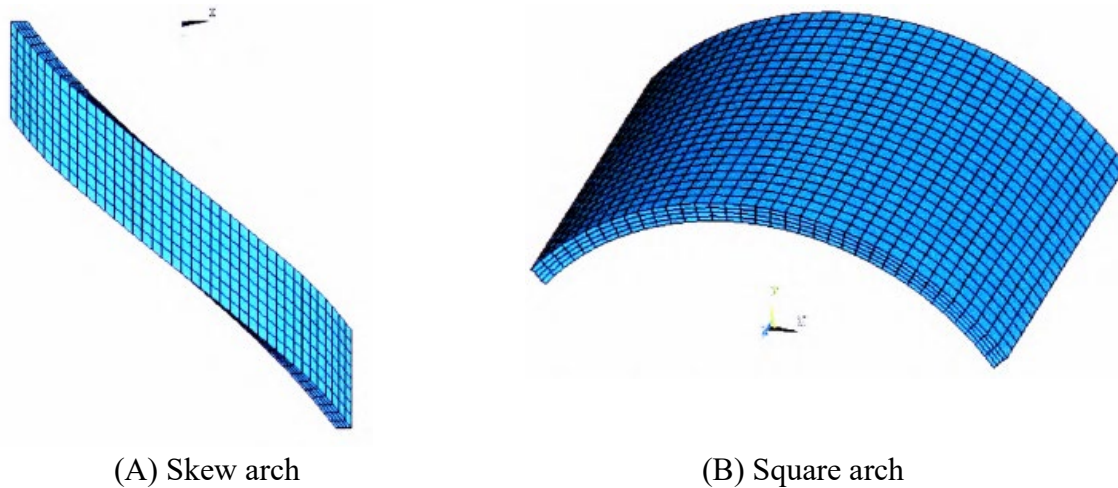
Masonry arch bridge 3D models (Wang, 2004).
